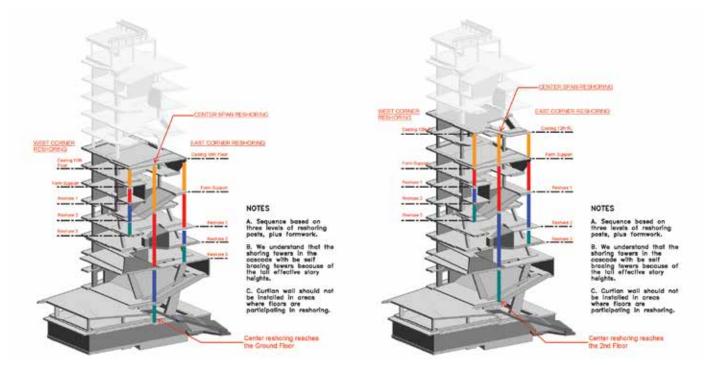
Due to variation in support arrangements of the Cascade, concrete reshoring requirements varied along the south façade of the building (Source: Diller Scofidio + Renfro)
